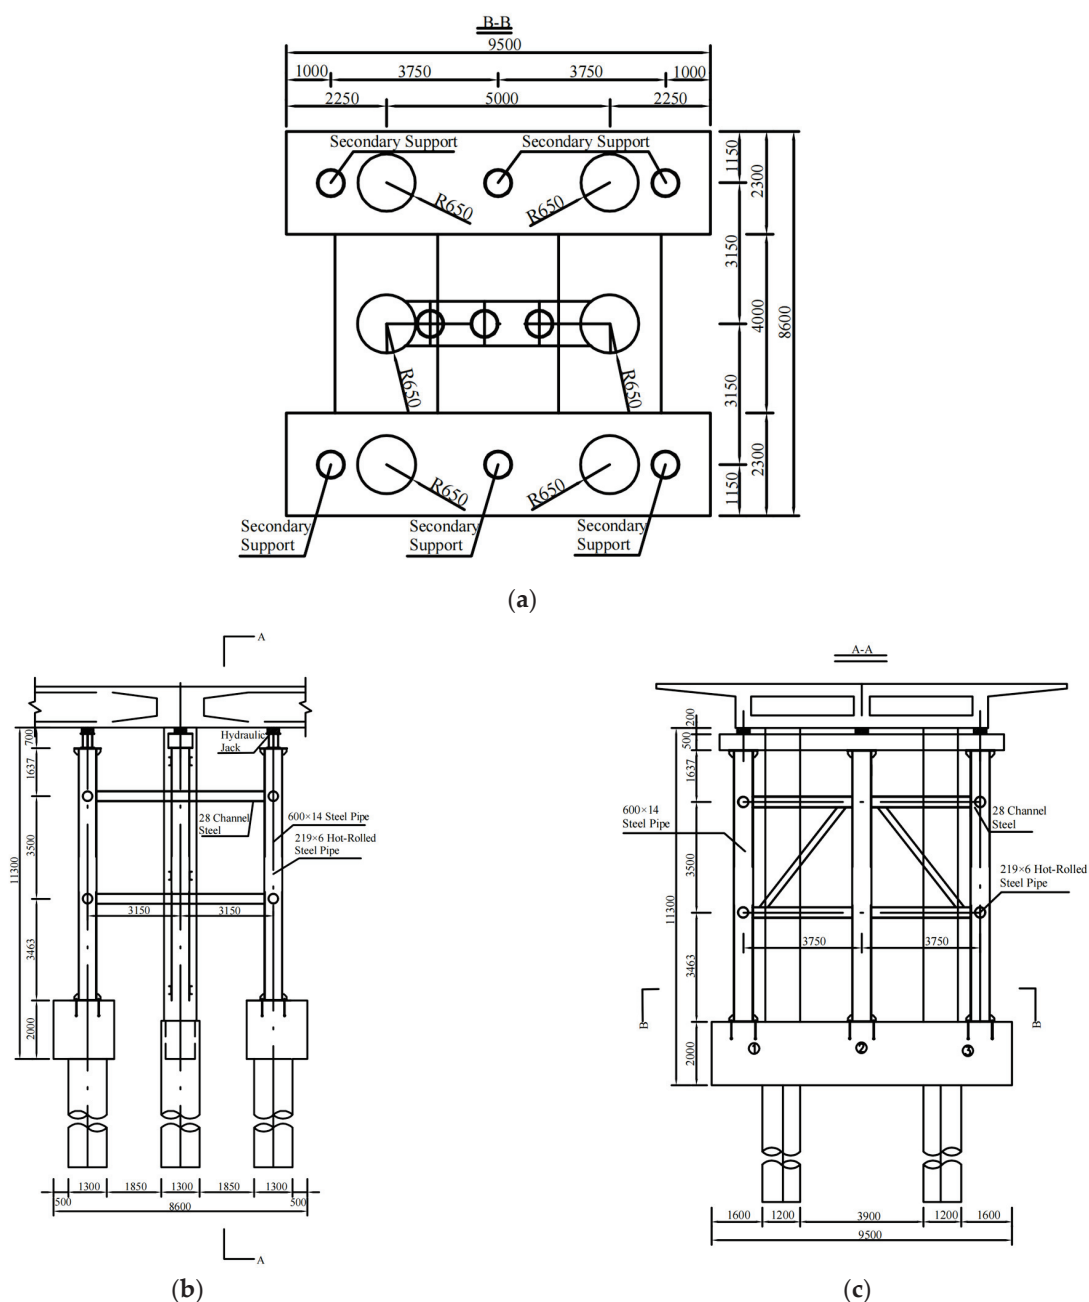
Schematic diagram of the underpinning support system. (a) Layout plan of the new pile foundation and bearing platform. (b) Elevation view of the steel pipe support system. (c) Section view of the steel pipe support system.
